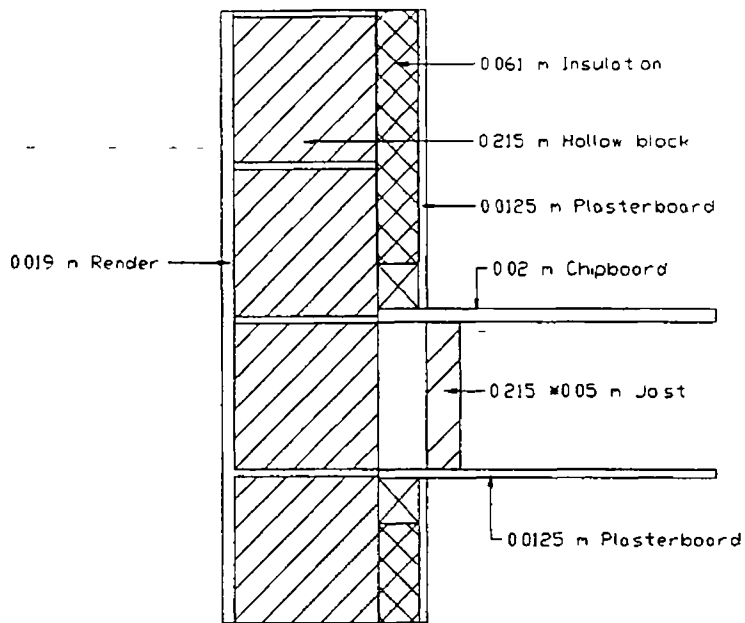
12 1 Semi-Detached Uninsulated Wall at First Floor Level in the Direction of the Joists
